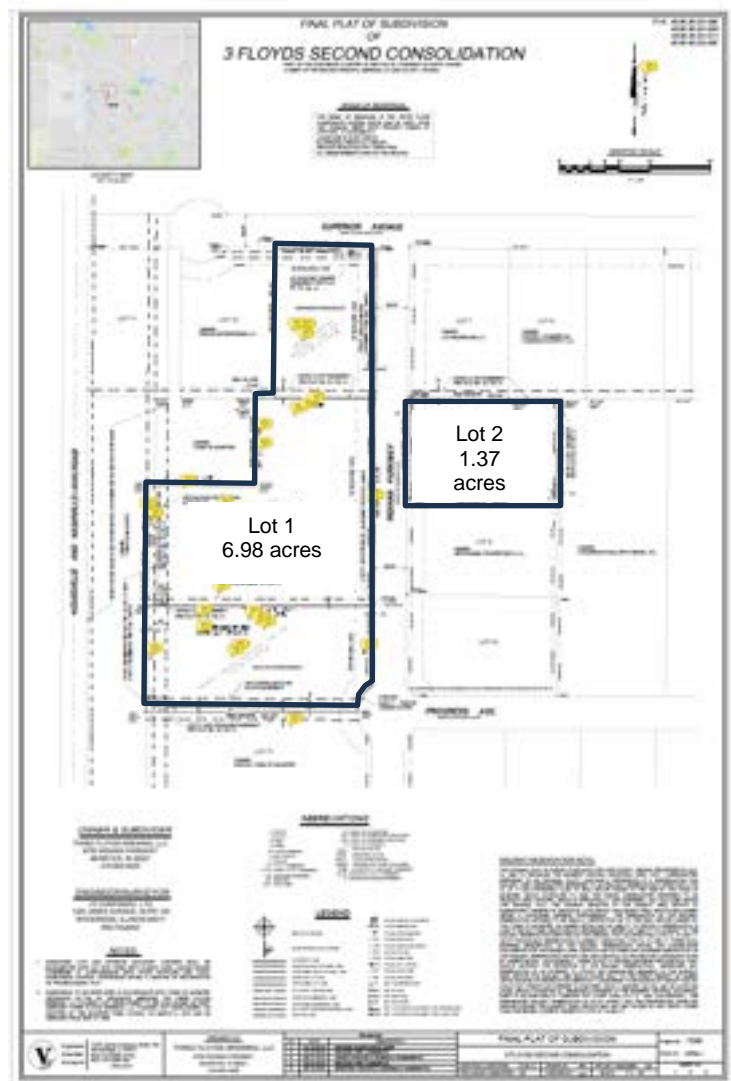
Proposed Final Subdivision Plat of 3 FLOYDS SECOND CONSOLIDATION
